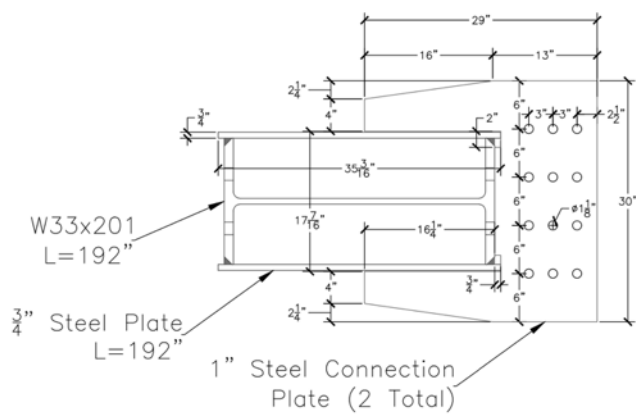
Sliding Beam and Connection Plate Cross Section
